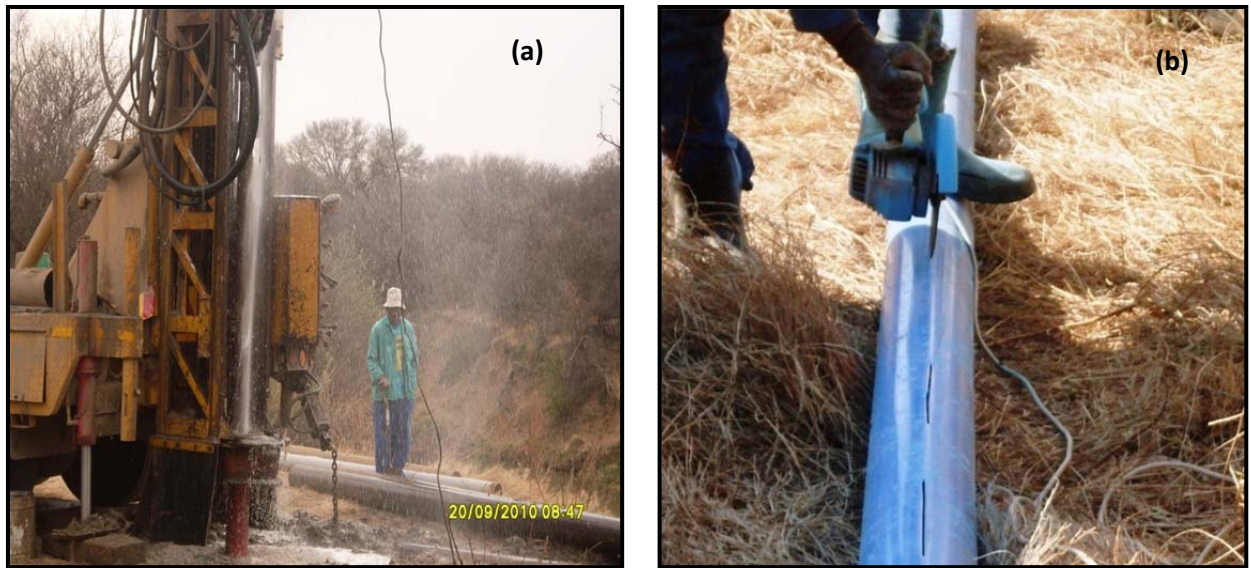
Photos of the showing: (a) Air percussion drilling equipment used for borehole drilling and (b) Poly Vinyl Chloride pipes used for boreholes casing; perforations on the pipe were handmade using a grinder machine.
